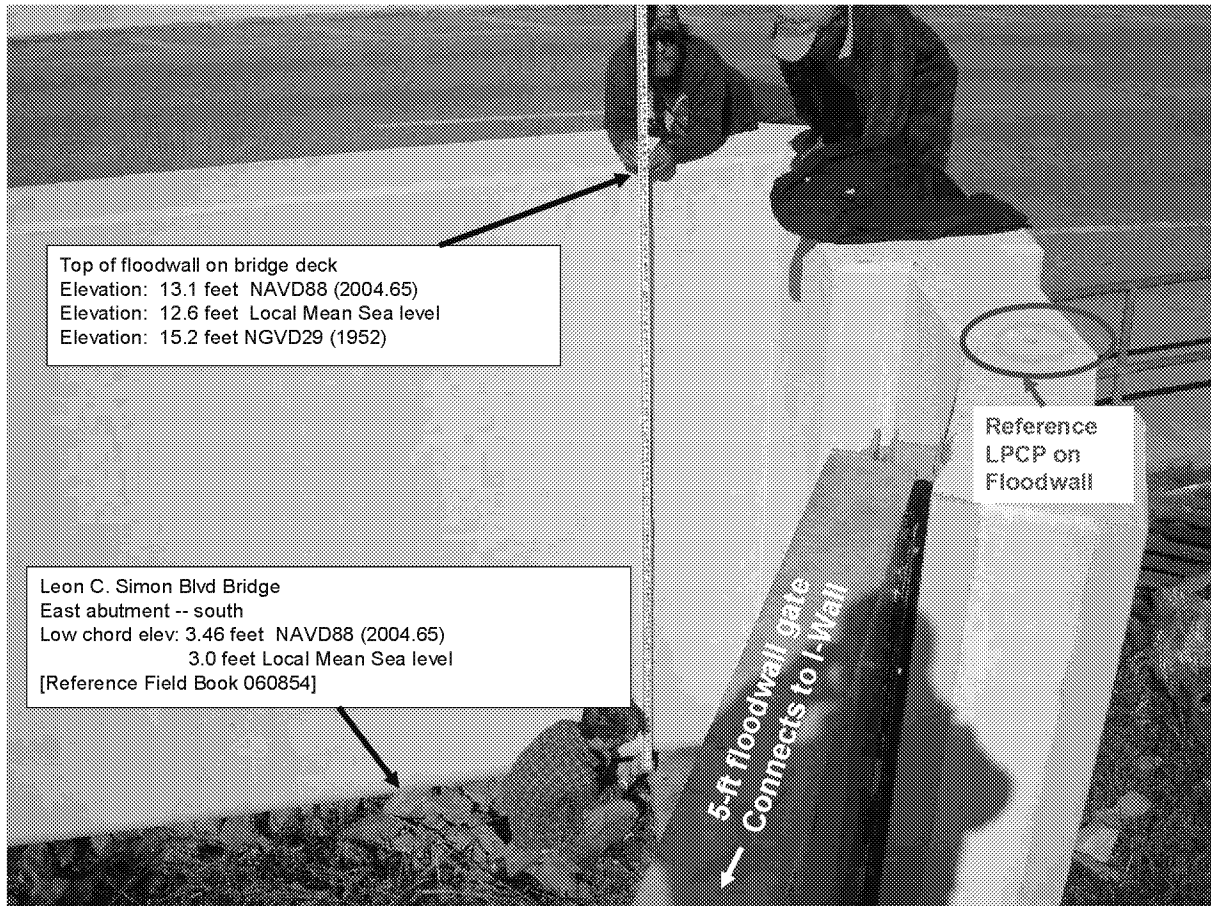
Surveying elevations of bridge chords, flood gates, and floodwalls.
